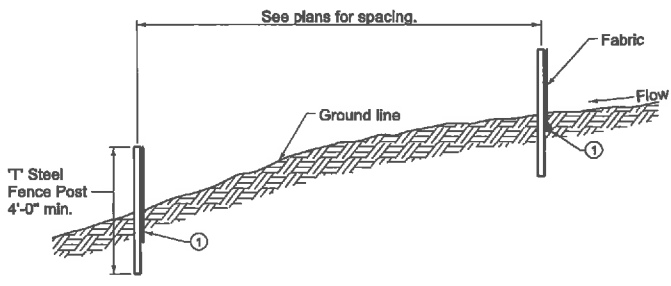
DETAILS OF SILT FENCE ON LONGITUDINAL SLOPES
